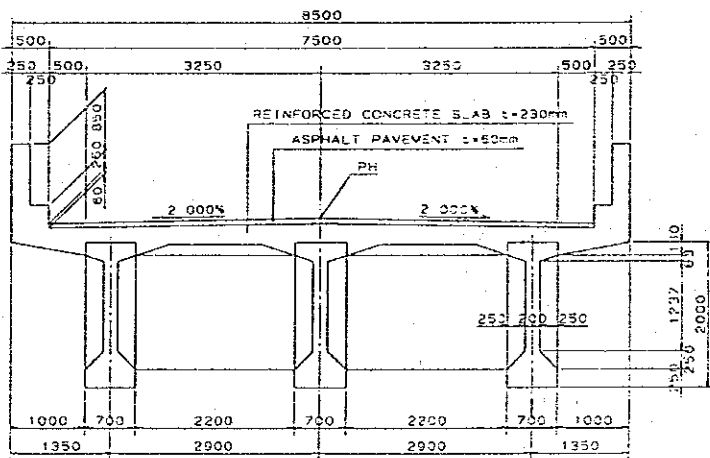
Typical Cross-section of Superstructure (Span length = 30 m)
